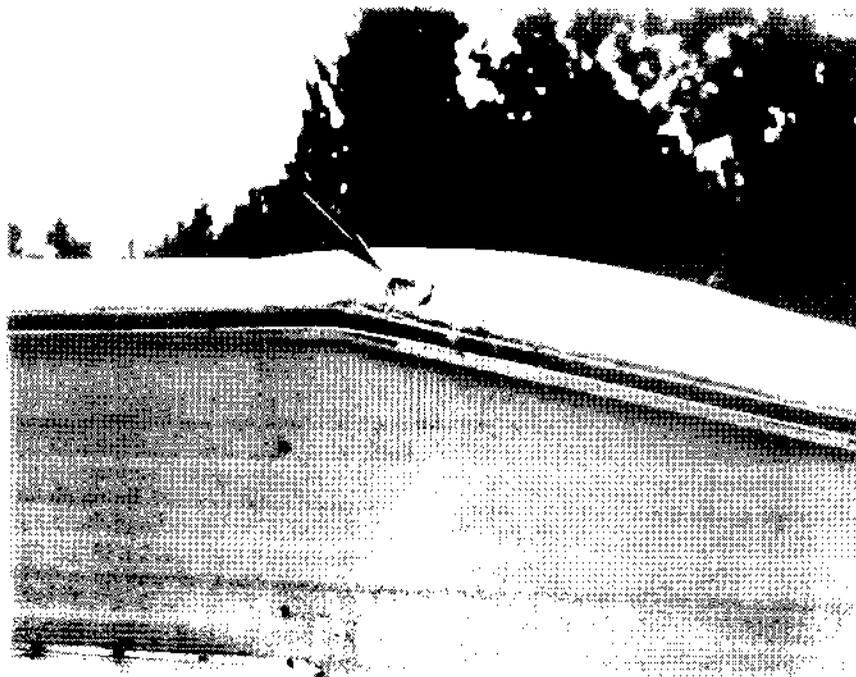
Crimped Steel Membrane at Change in Slope of Roof
